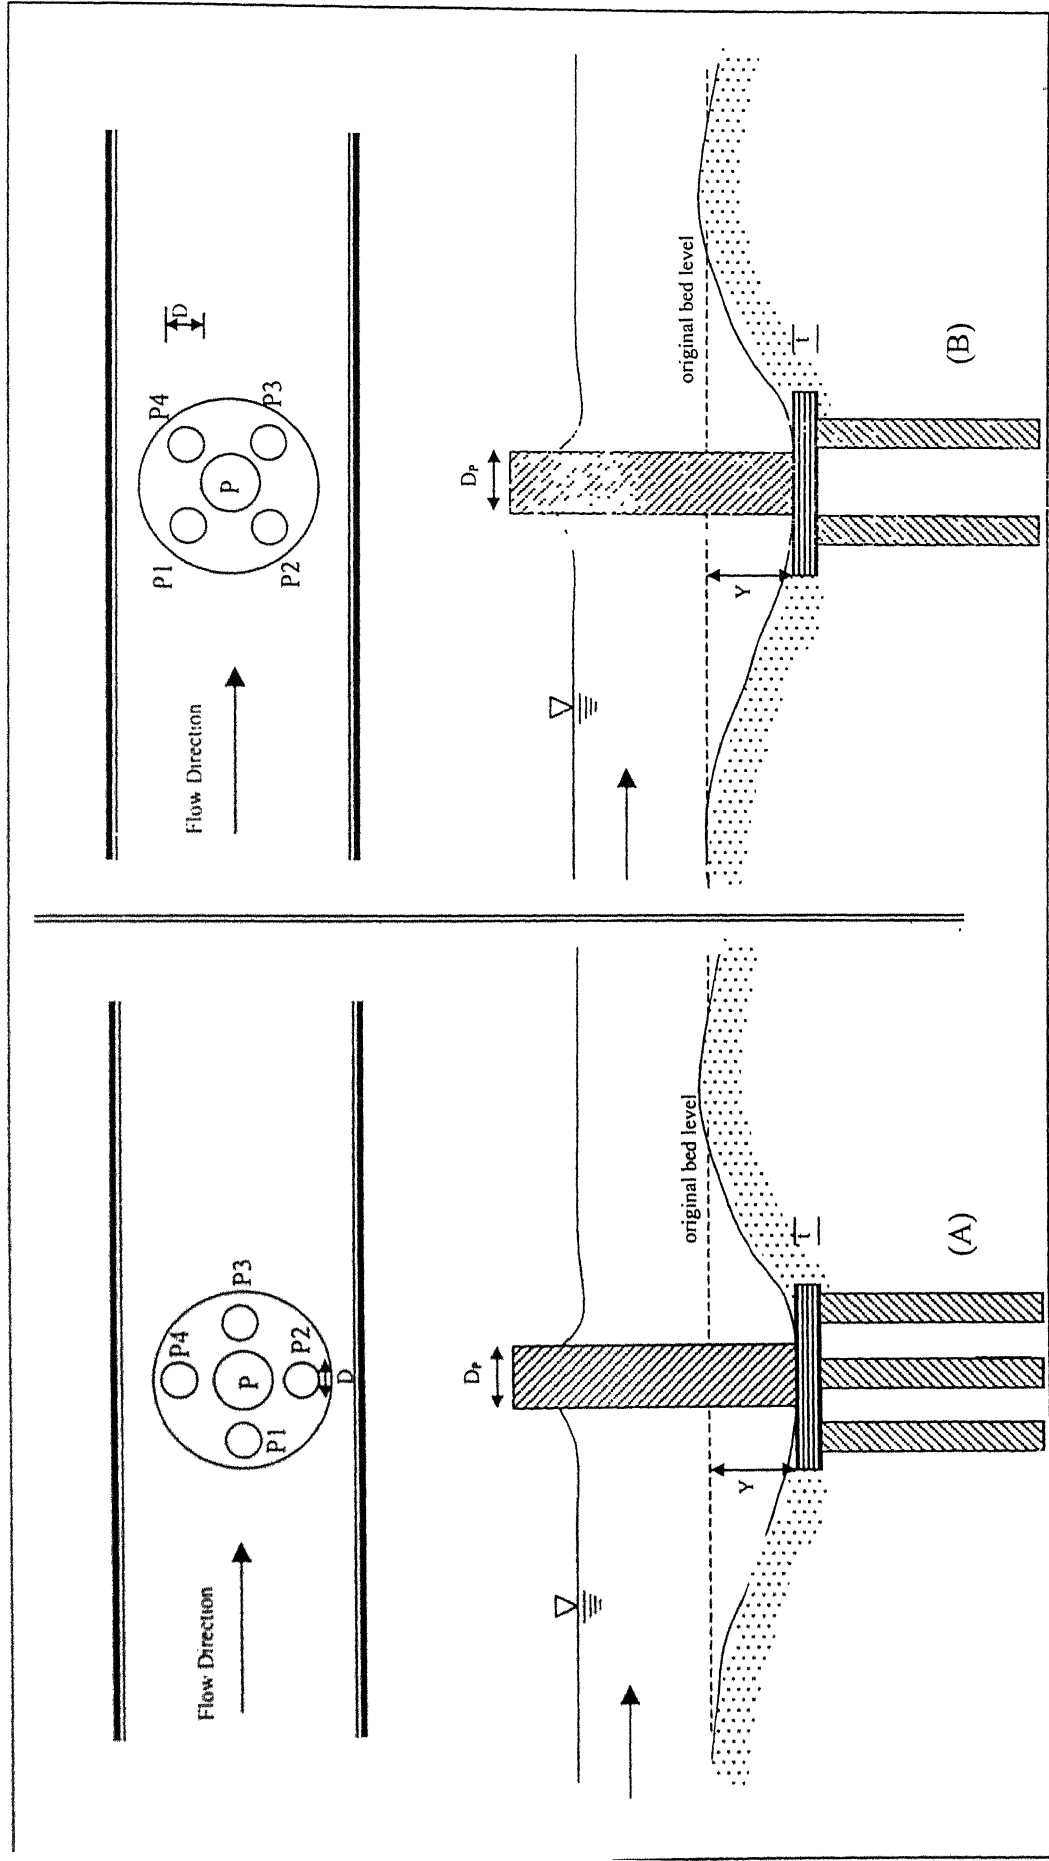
Pier founded on piles with pile cap in (A) Diamond and (B) Square pattern
